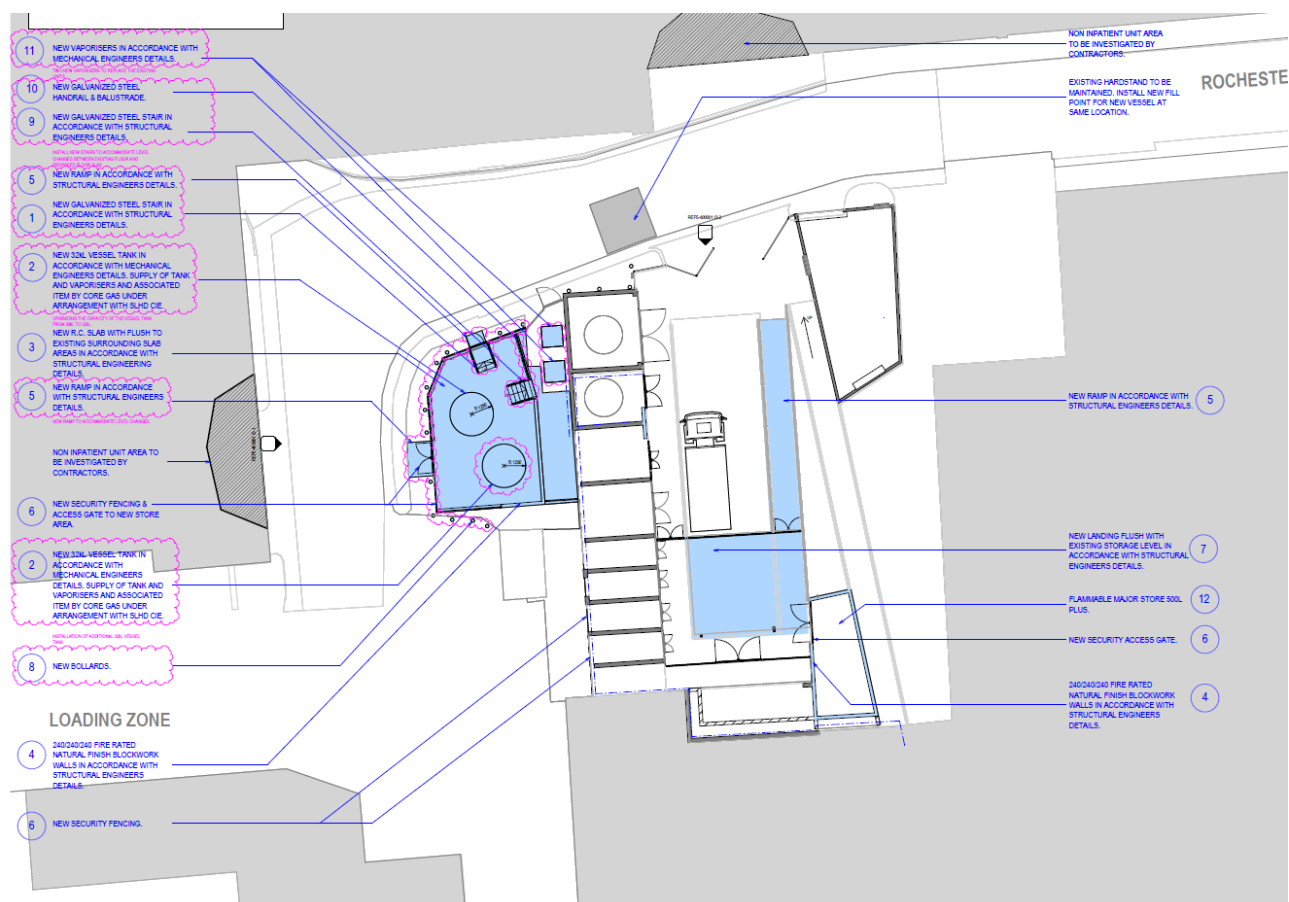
Amended Proposal - Level 1 Plan (source: Jacobs dated 21 February 2025)
